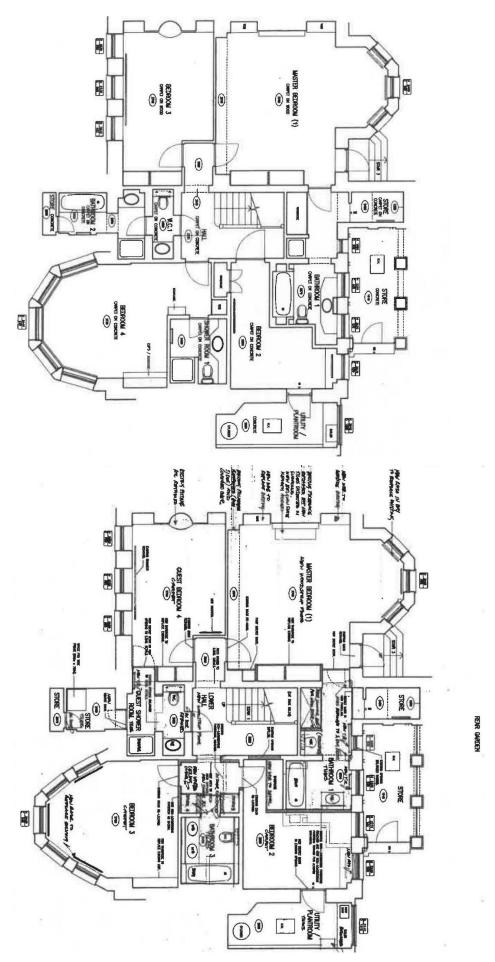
Existing (top) and proposed (bottom) lower ground floor plans, 2003.
